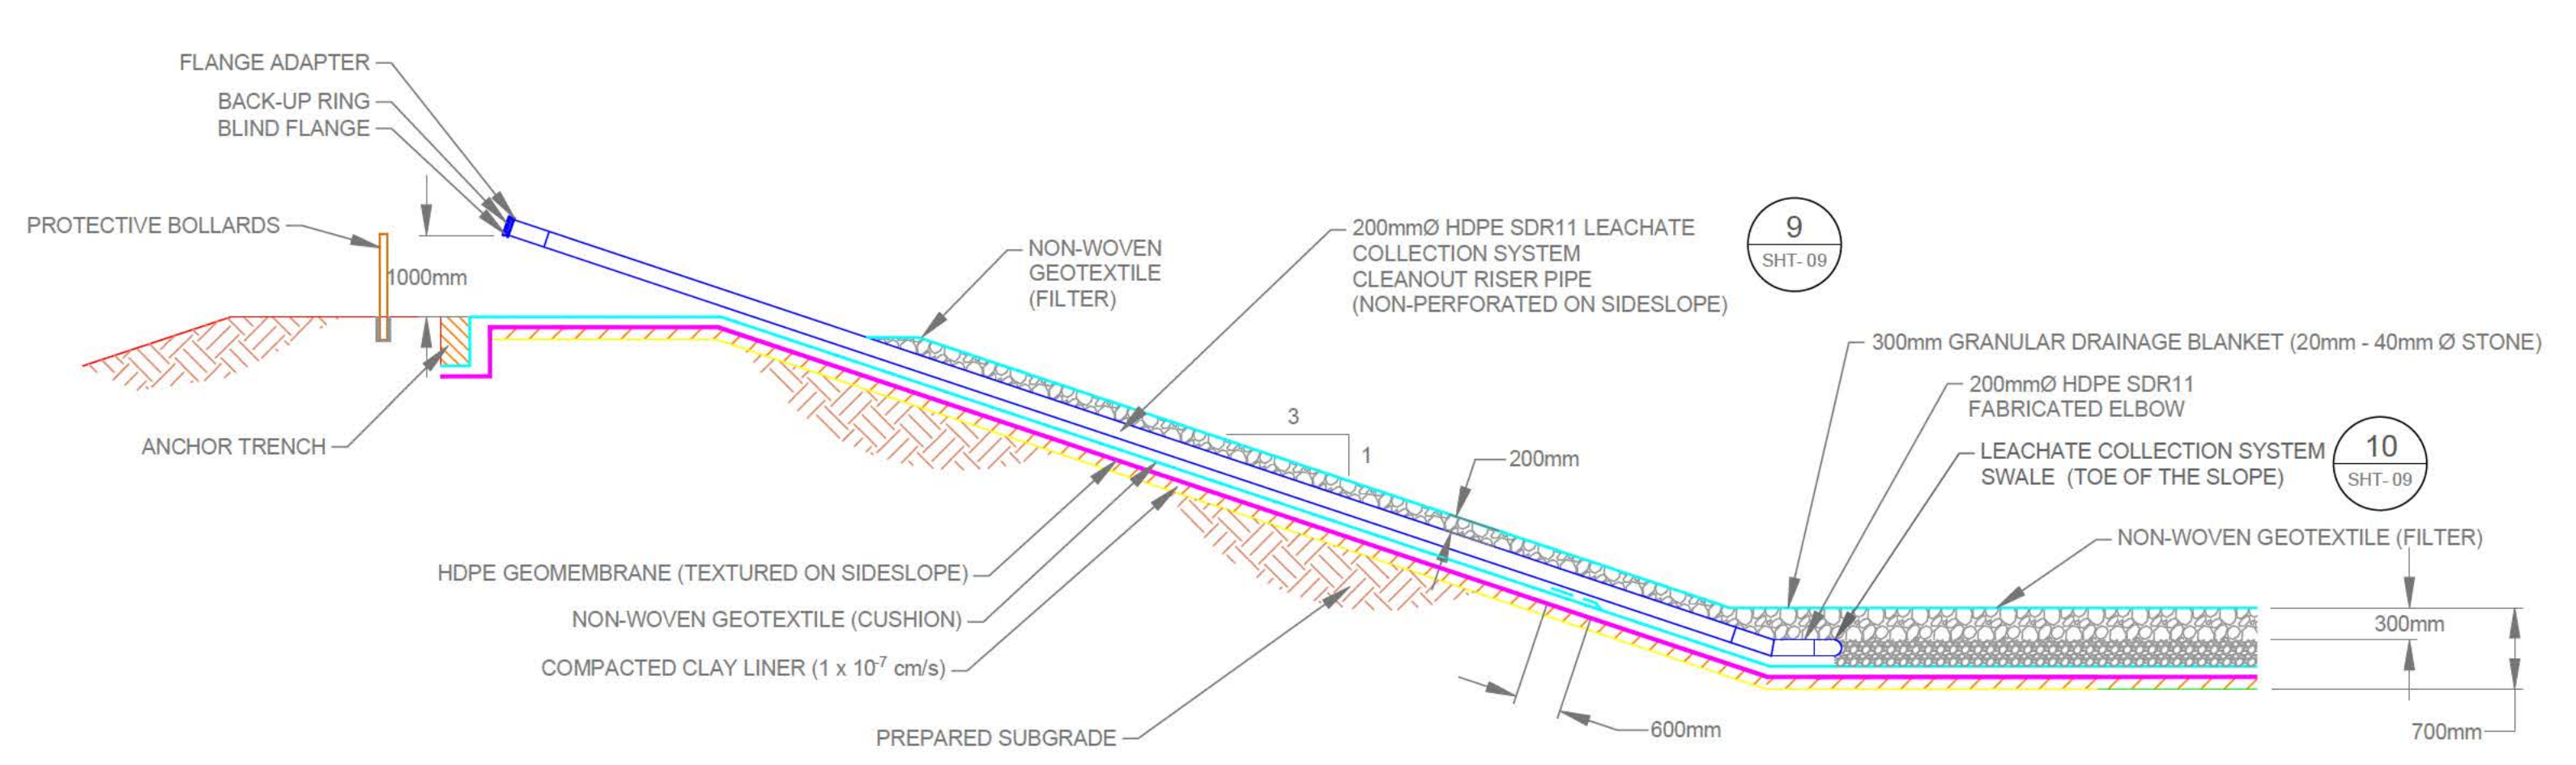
LEACHATE COLLECTION SYSTEM CLEANOUT RISER PIPE ON SIDESLOPE
